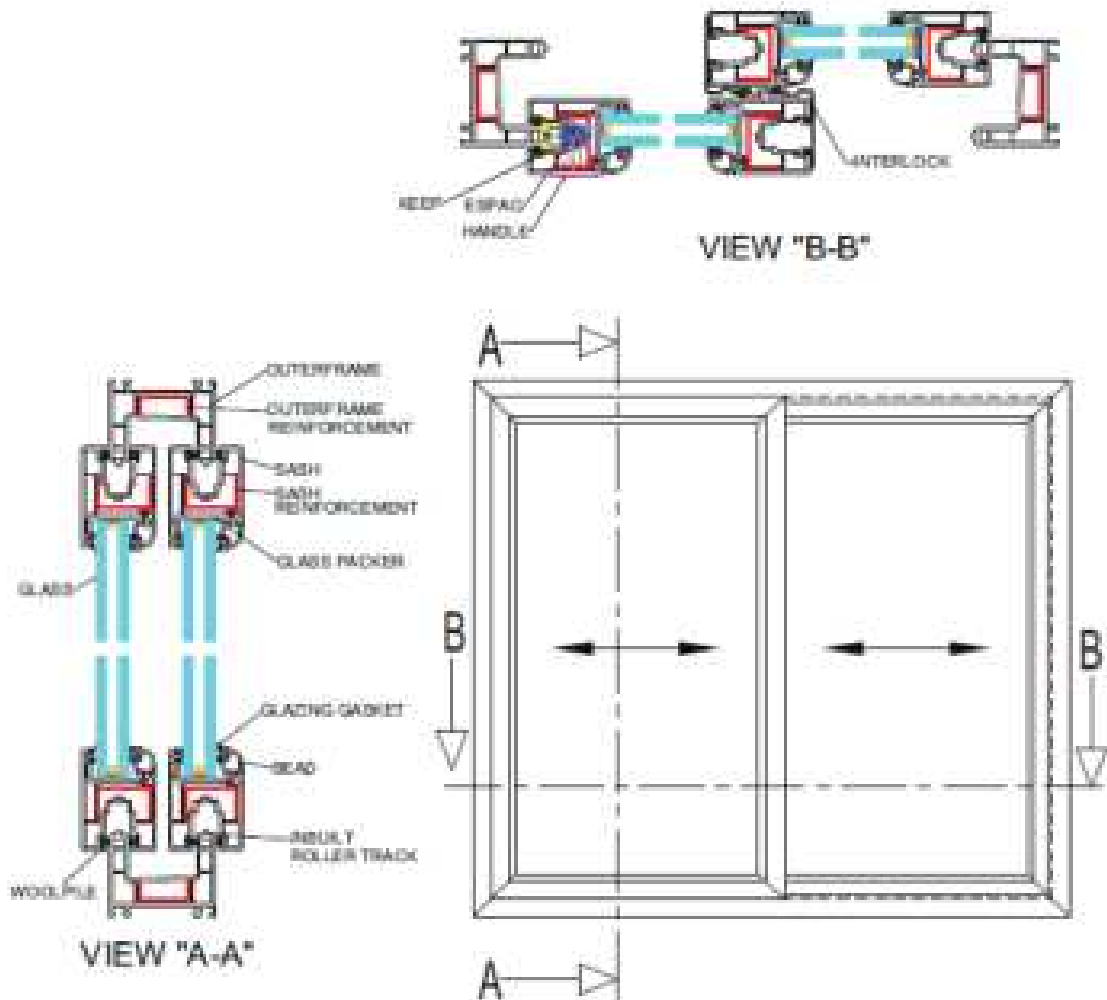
uPVC Doors & Windows (Typical Slider System)
